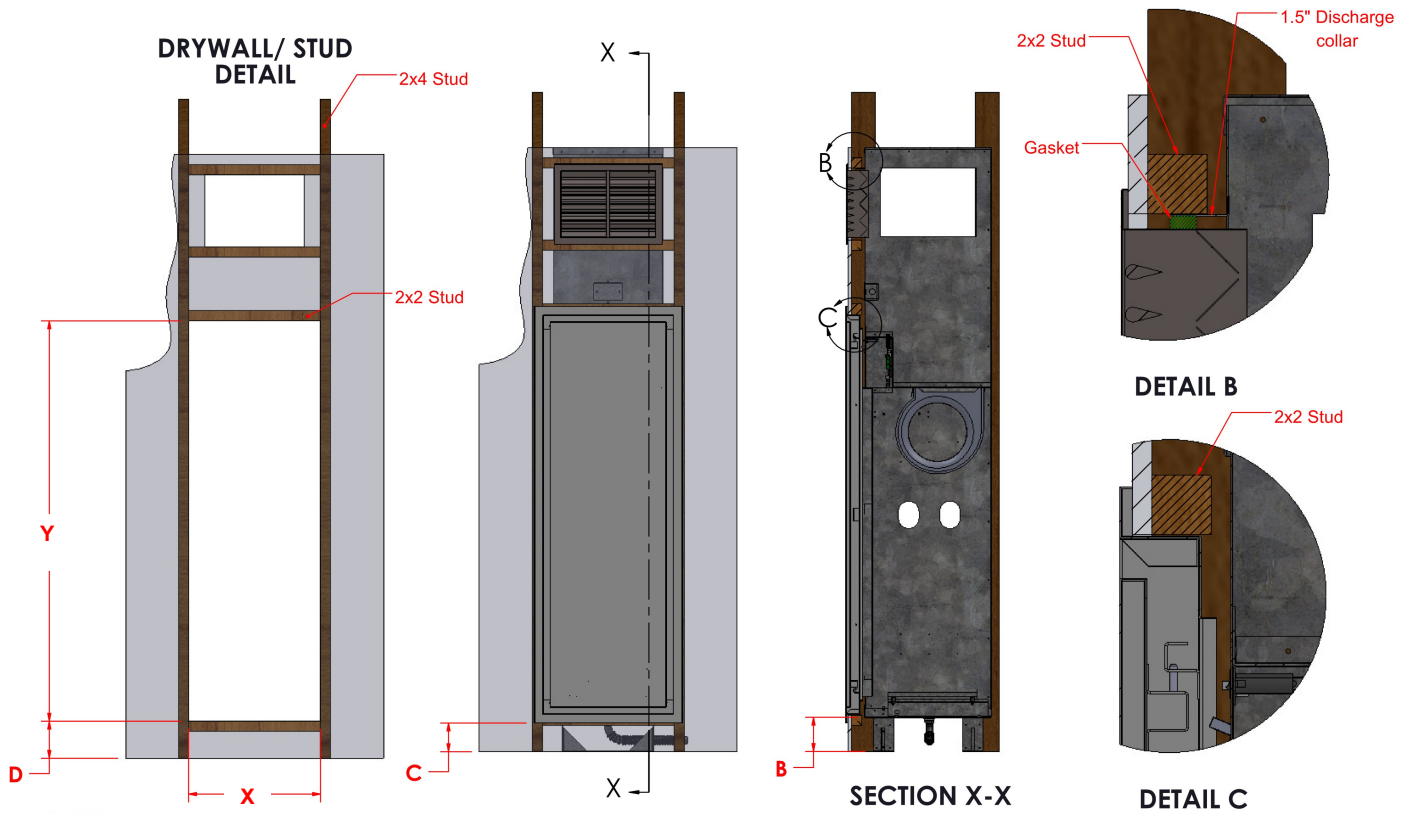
Perimeter Panel Furring Drawing- Front & Side View
